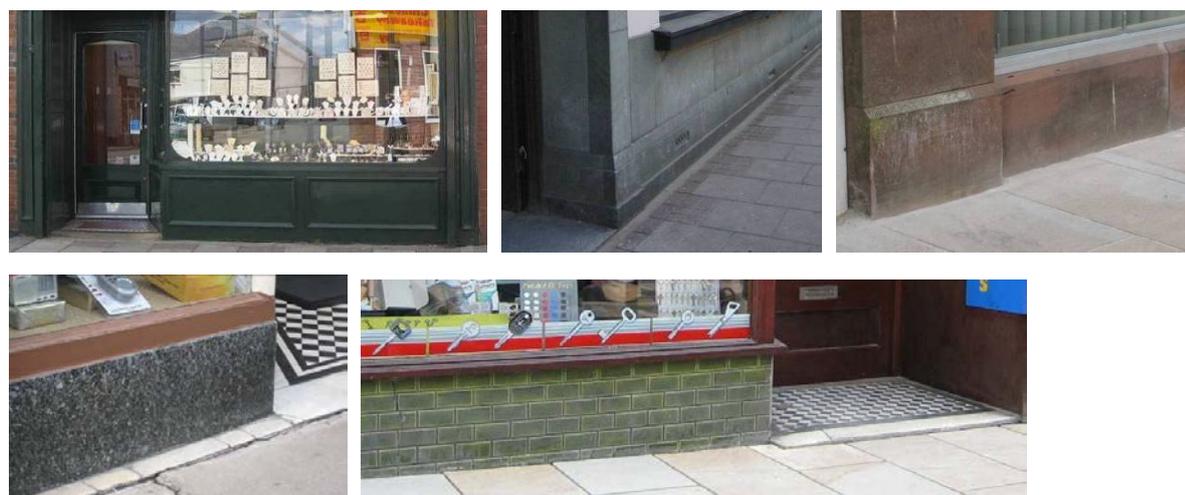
Traditional timber, ashlar stone, polished granite and glazed tile stallrisers have a more elegant and substantial appearance
